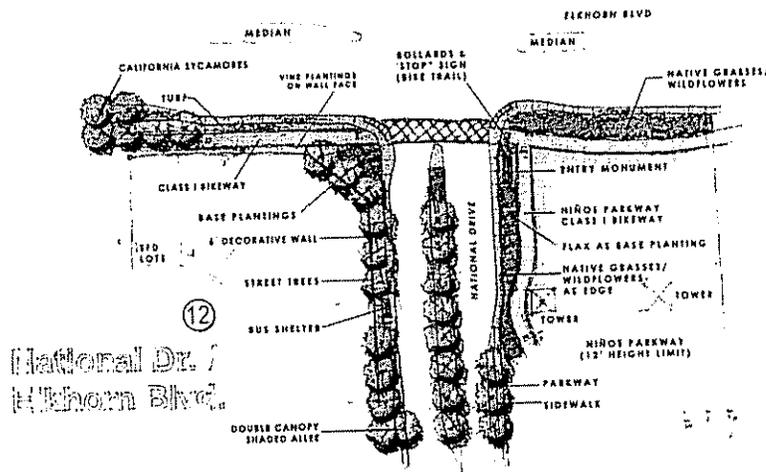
Schematic Landscape Plan 12. National Drive and Elkhorn Boulevard.
